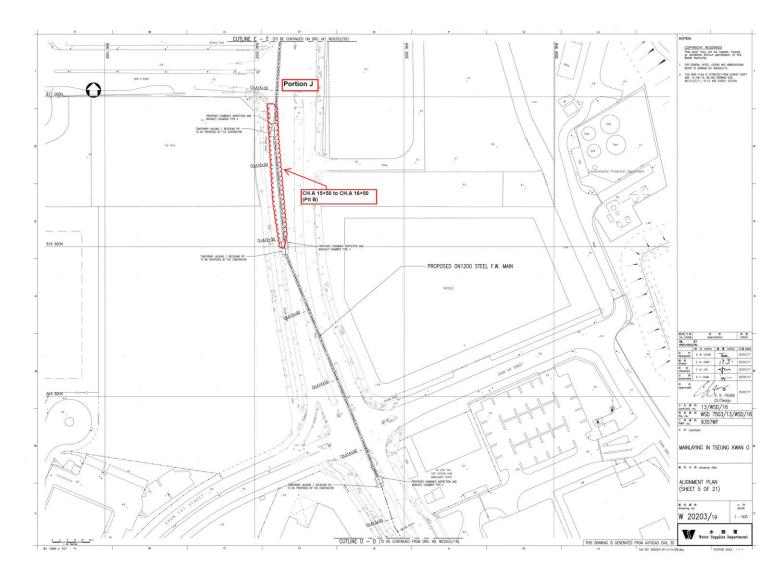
Location Plan for Portion J – CH. A15+50 to CH.A 16+50 (Pit B)
